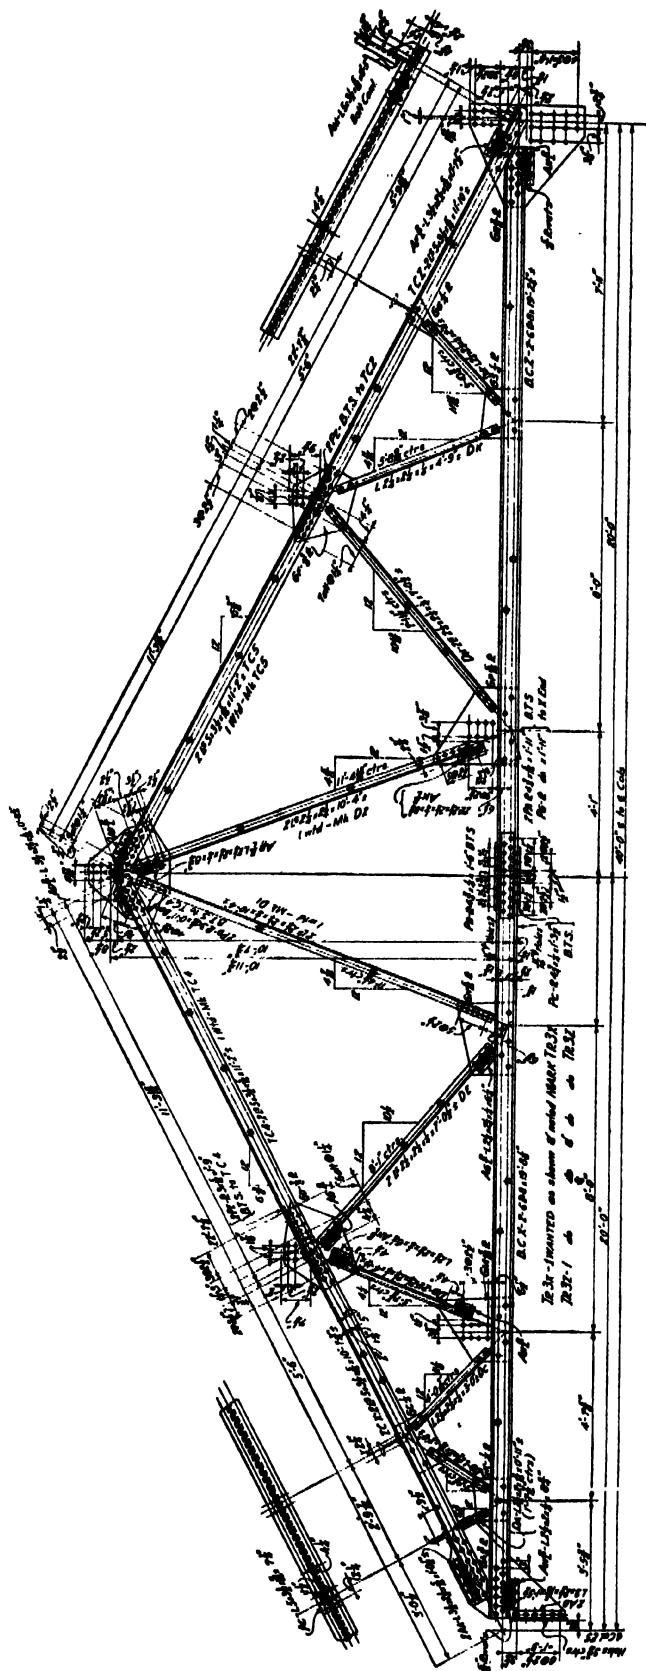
TYPICAL SHOP DRAWINGS OF TRUSSES
